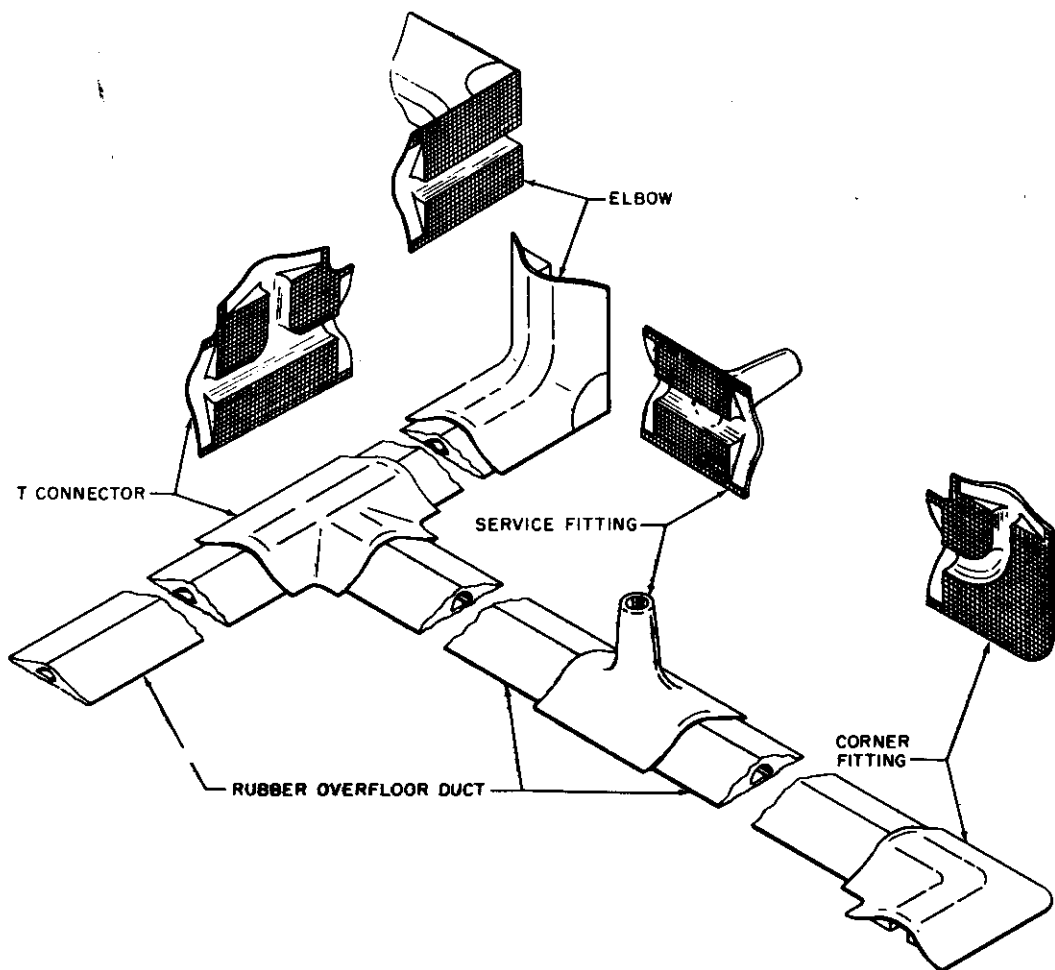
Rubber Overfloor Duct Fittings, Typical Installations
